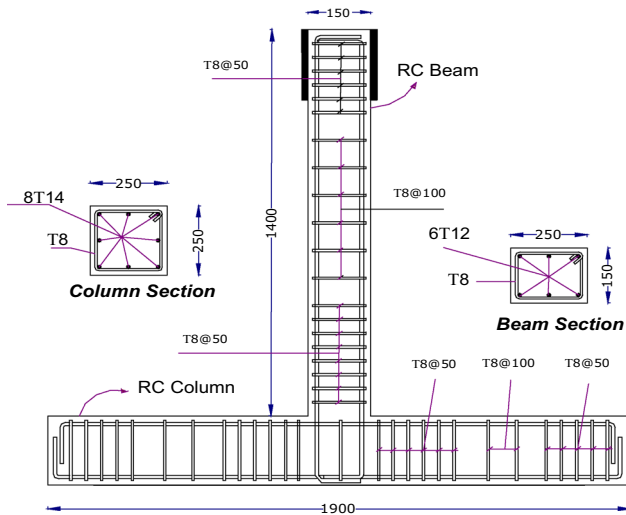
Geometric properties and reinforcement details of all specimens (in mm)
